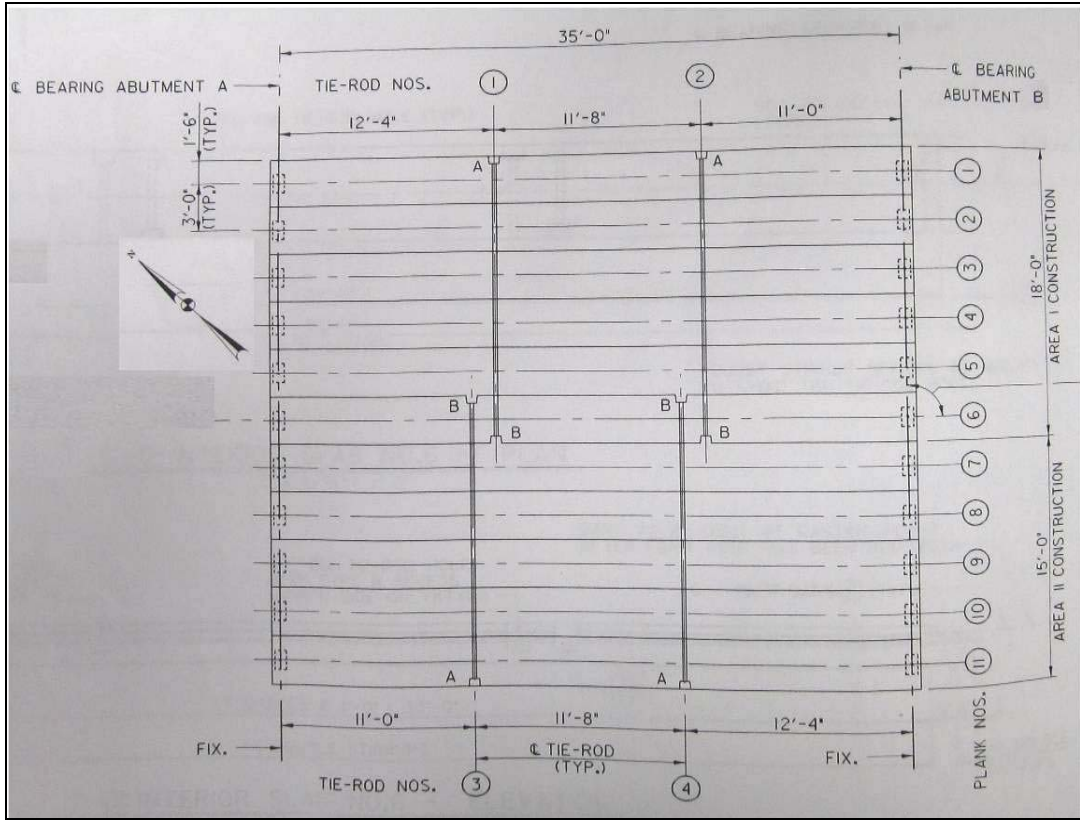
Structure No. 0901100 Wallace Creek Bridge (Plan View)
